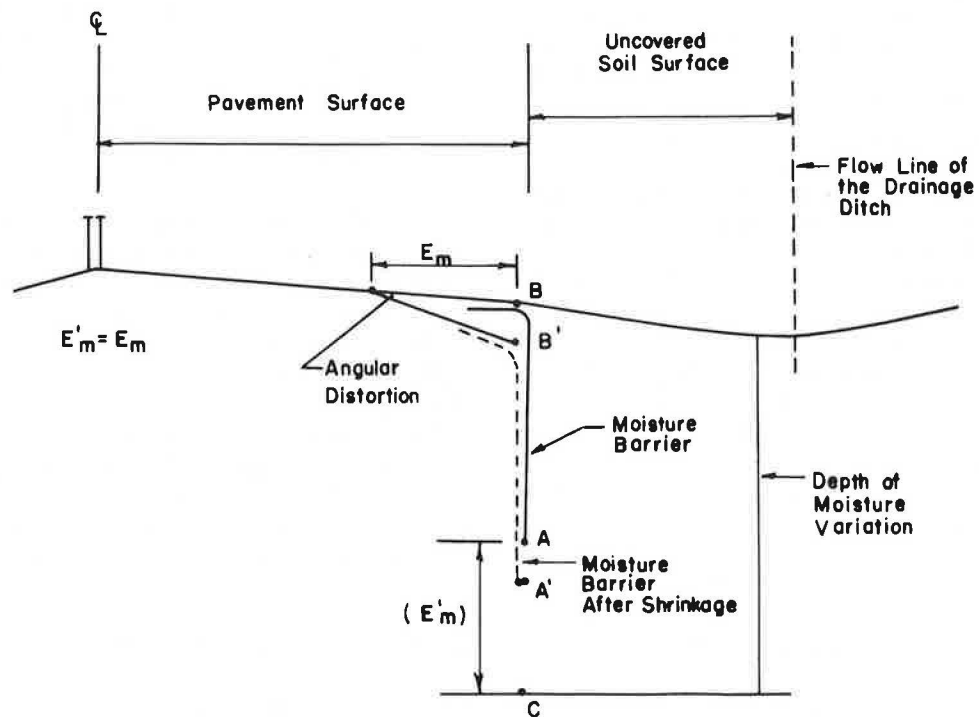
Illustration of the differential drying conditions under the pavement edge.
